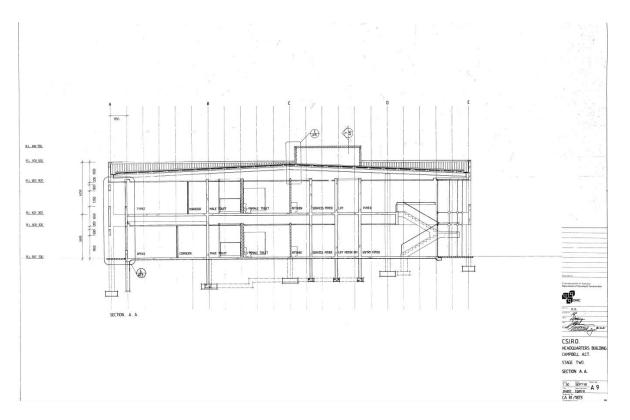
Original architectural drawings of Building 3, section detail, 1981. (Source: DOMA Group)
